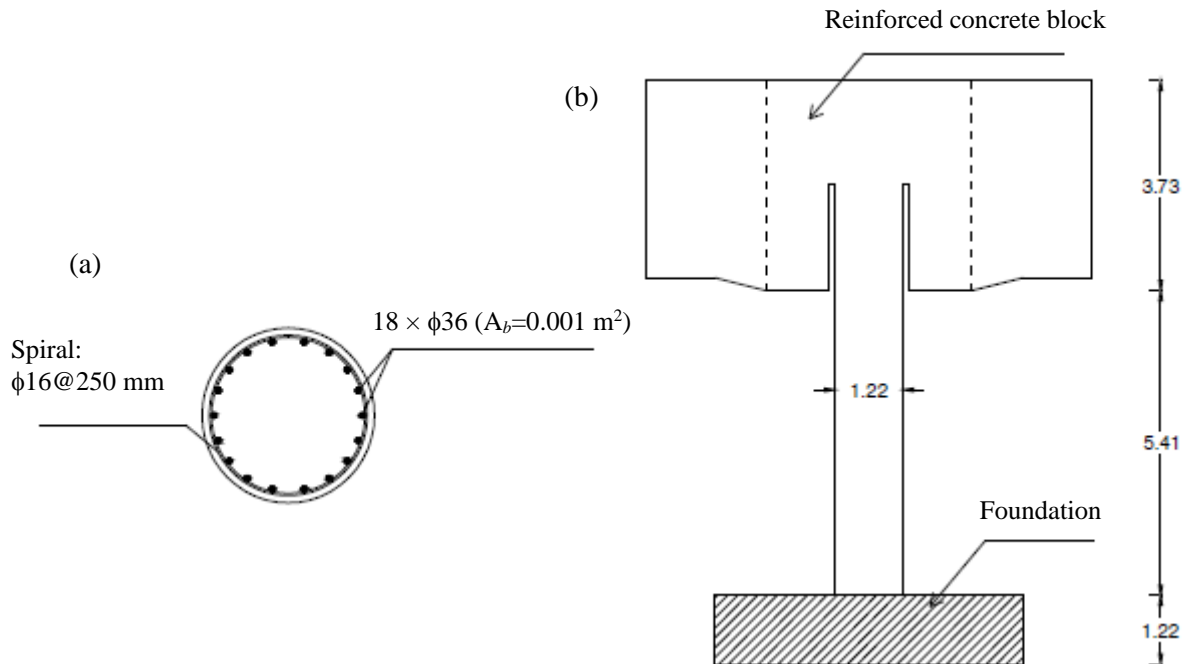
(a) Bridge column cross-section. (b) Geometrical dimensions of the column [m] (Terzic et al. 2015).
